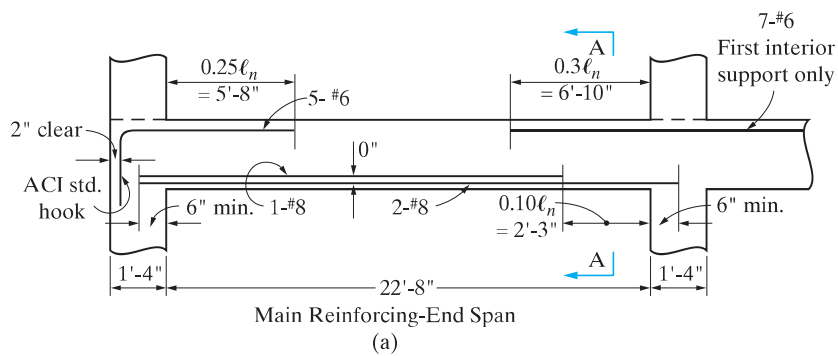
Design sketches for Example 6-1 (stirrup spacings not shown).
